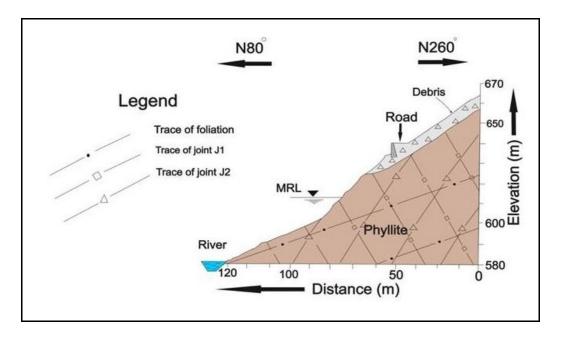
Geological Section of Slope RBS6 located at 2.7 km away from the Zero Bridge towards the dam site (just u/s of Dharamghat Village)
